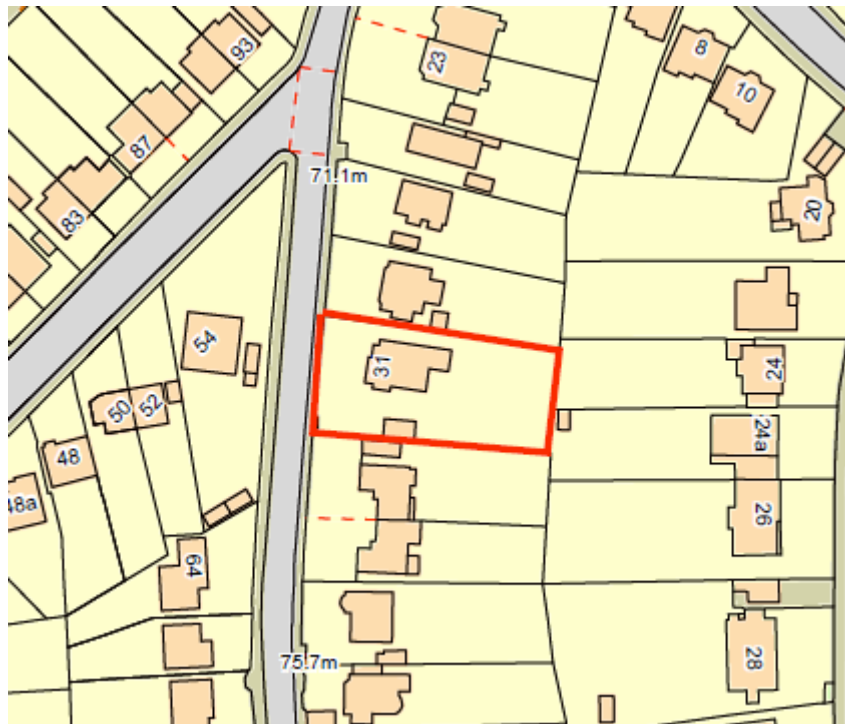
Plan highlighting the existing site and the relationship with the adjoining occupiers. (Not to a scale)
